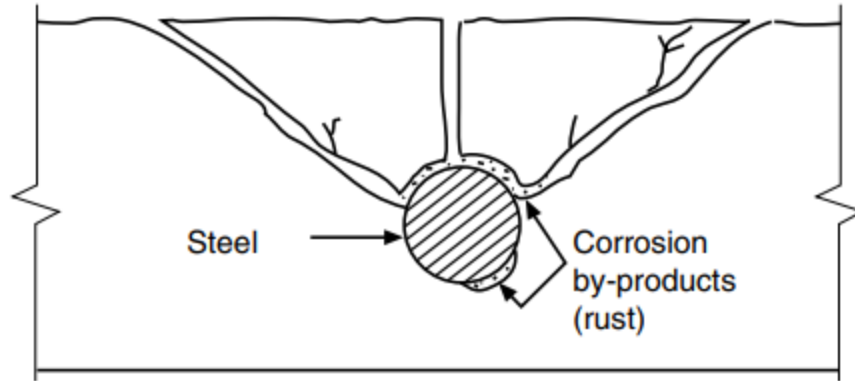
Schematic of cracking in concrete due to corrosion of reinforcing steel (PCA 2002)
